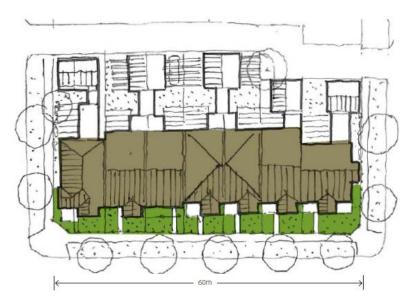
Maximum wall length for attached dwellings and Shop-top housing.
